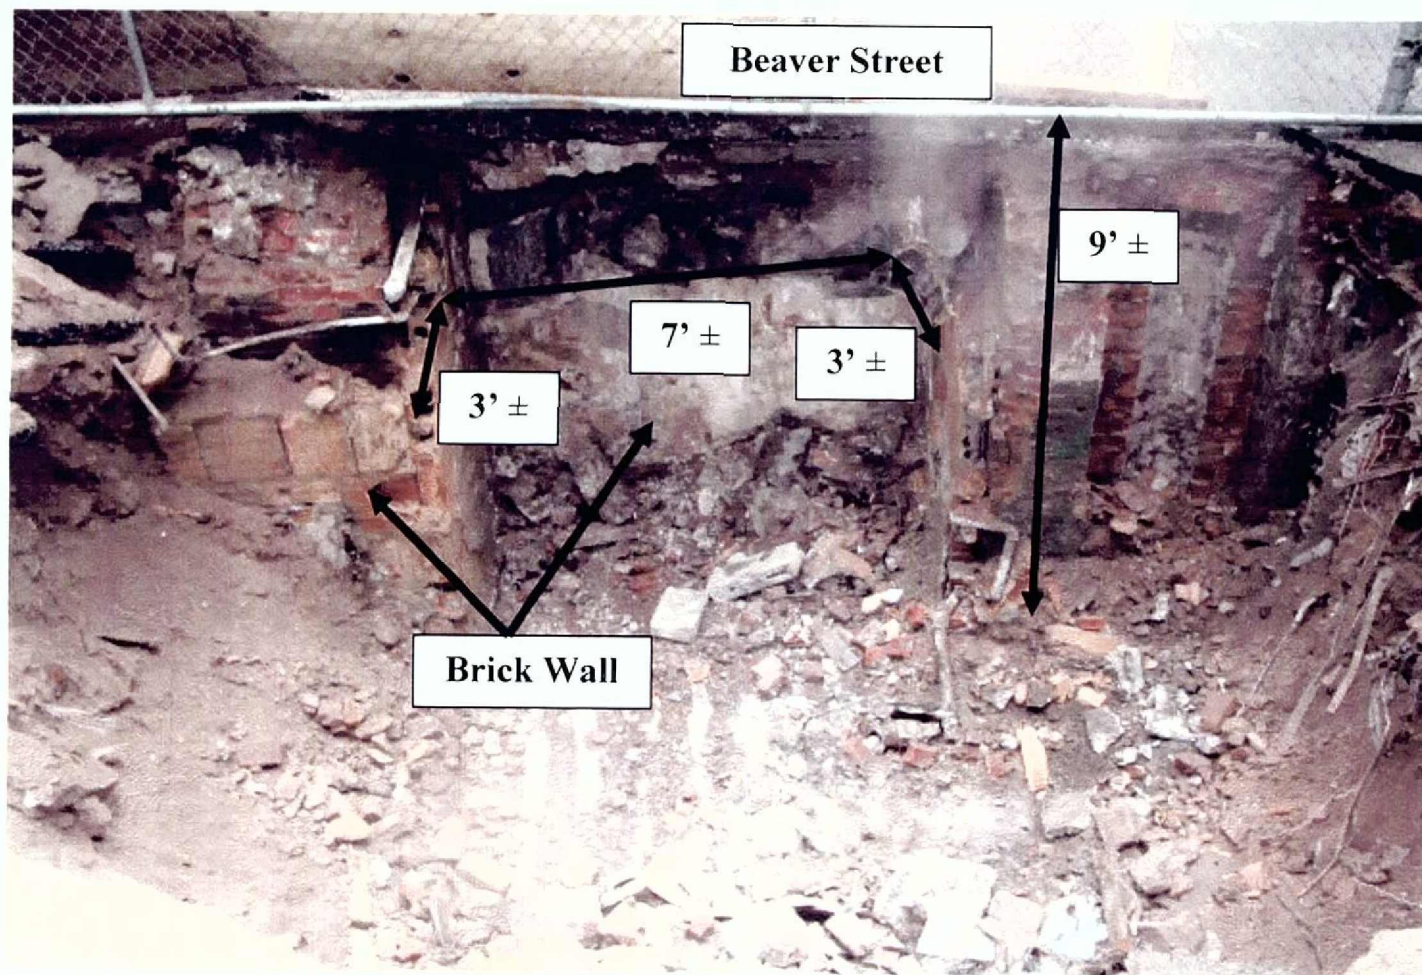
TP-3: Space between top of the NYCT tunnel and the ceiling of the vault.
